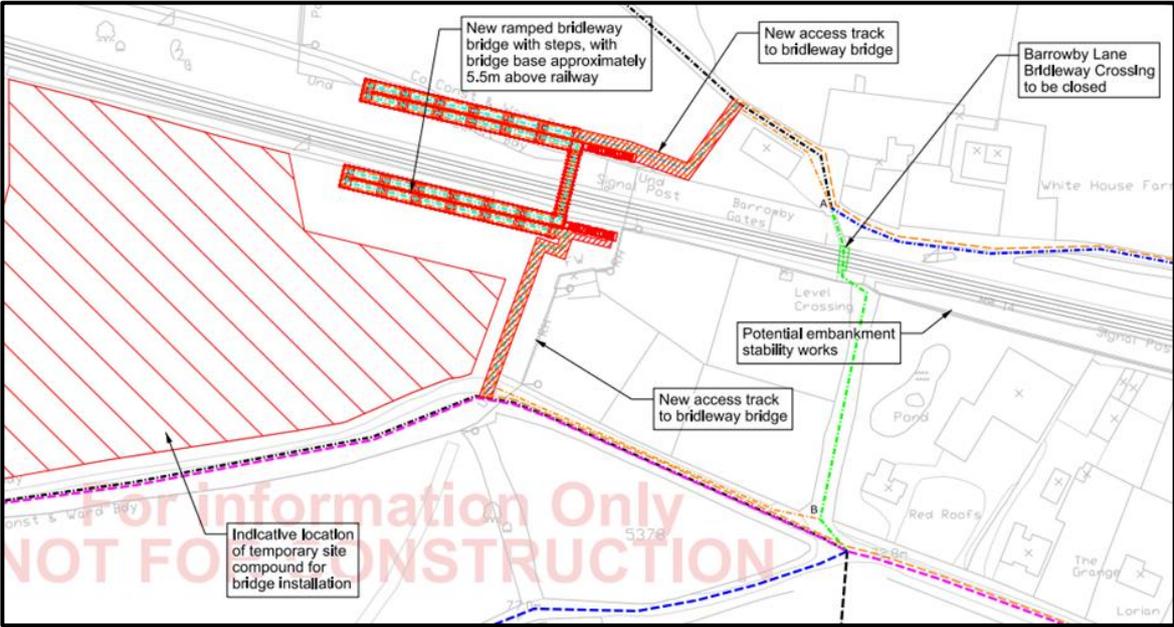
Option 1 – New ramped brideway bridge at Barrowby Lane Level Crossing
